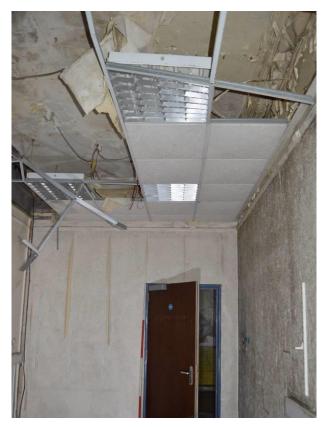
Modern door and suspended ceiling but with features above. Scale 2m. Facing south east.
